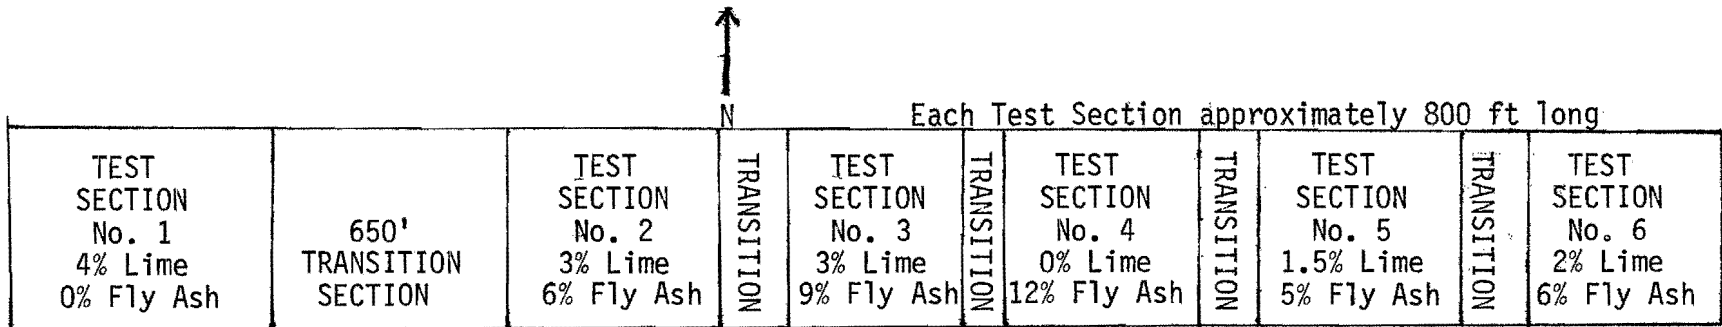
Layout Plan View of Test Sections on FM 1604 in Bexar County, Texas (Site No. 4)
